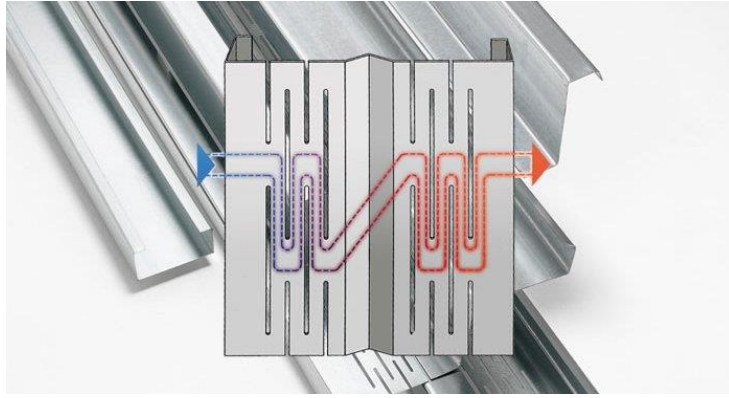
Thermal transmittance in wall sections with slotted steel sections
